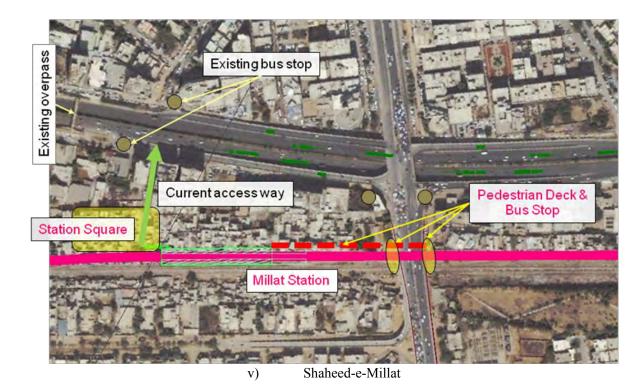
Provisional Station Plaza Plan (14/15)
